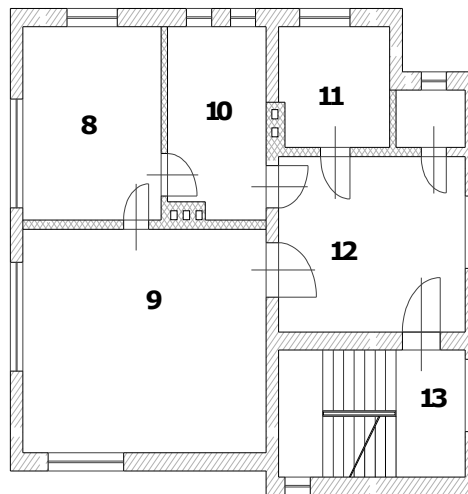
Ground plan of the 2nd floor: 8 – bedroom; 9 – living room; 10 – bathroom; 11 – kitchen; 12 – hall; 13 – stairs
